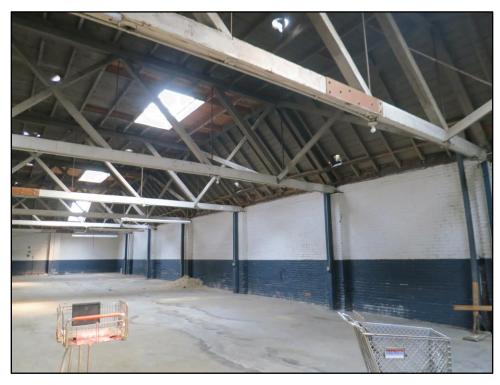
Overview of interior showing skylights in the Gilbert Garage.
